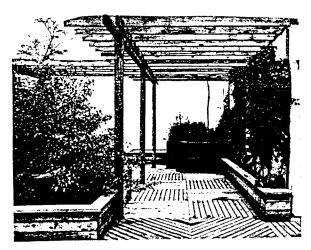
A roof deck with wood decking, trellis and planters. (from "Roof Decks Design Guidelines")
